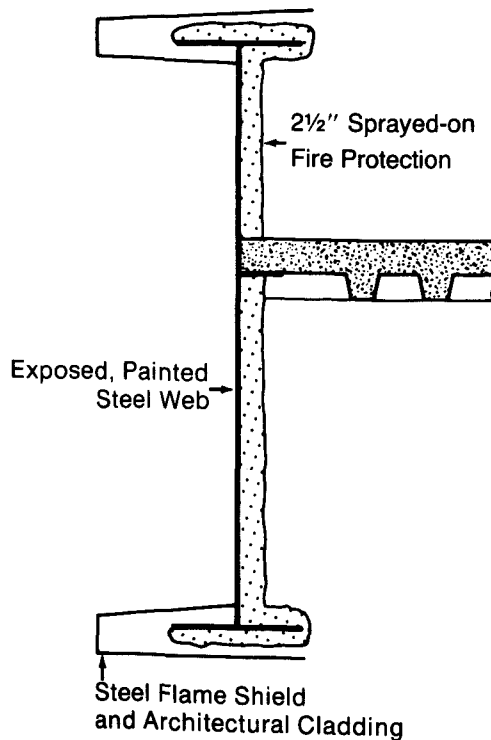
Fire-resistive flame shielding on spandrel girder of "One Liberty Plaza" building in New York City.
